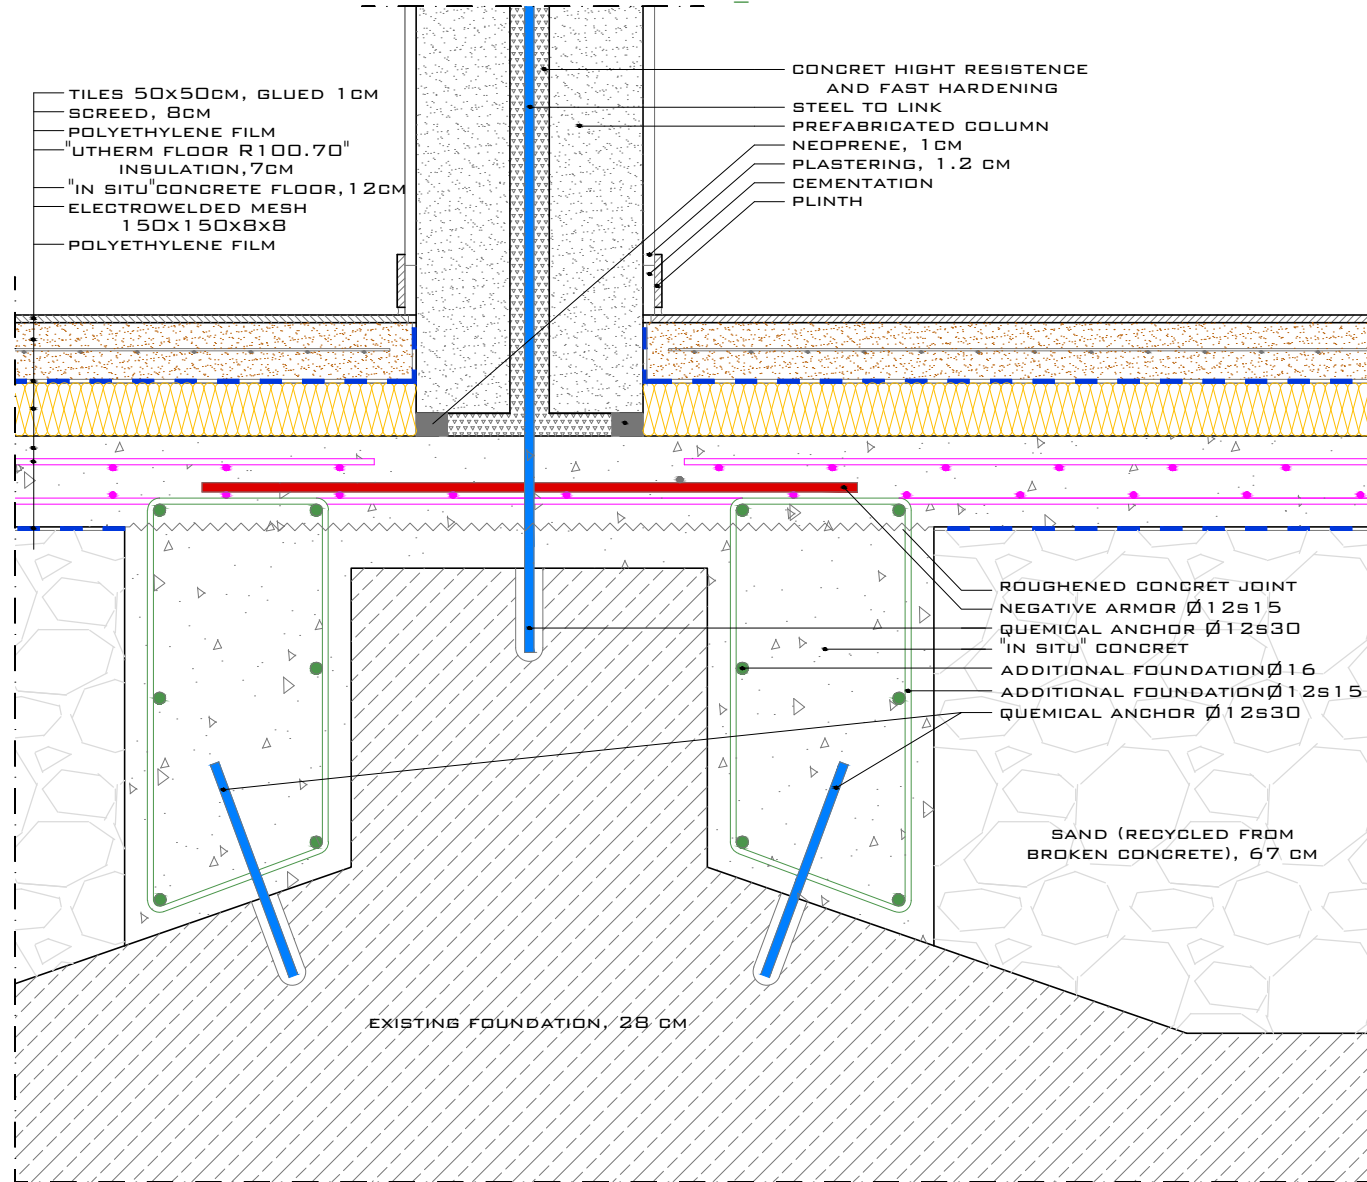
UNION COLUMN-BEAM-FLOOR \_ S:1/5
